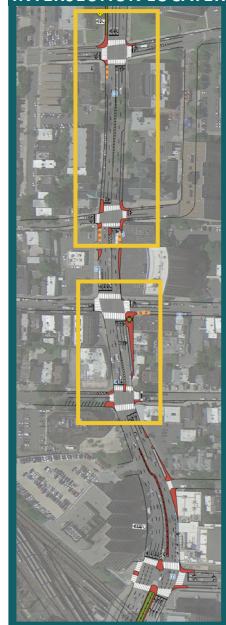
Van Winkle/Brooks Place to St. Paul's Avenue
